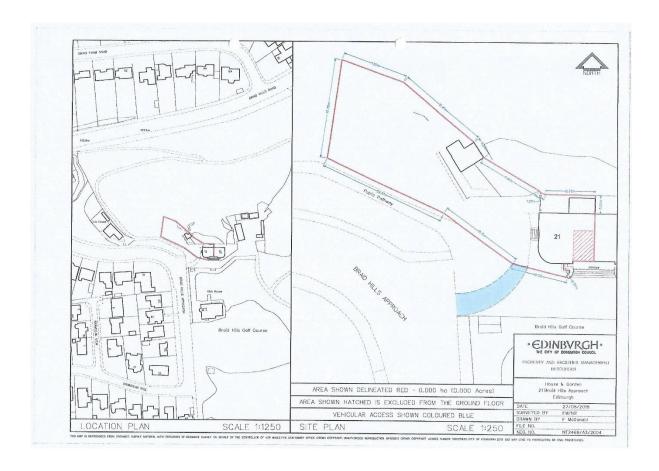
Deed plan provided to the applicant from Edinburgh City Council when purchasing the property which denotes and shows the "house & garden".
